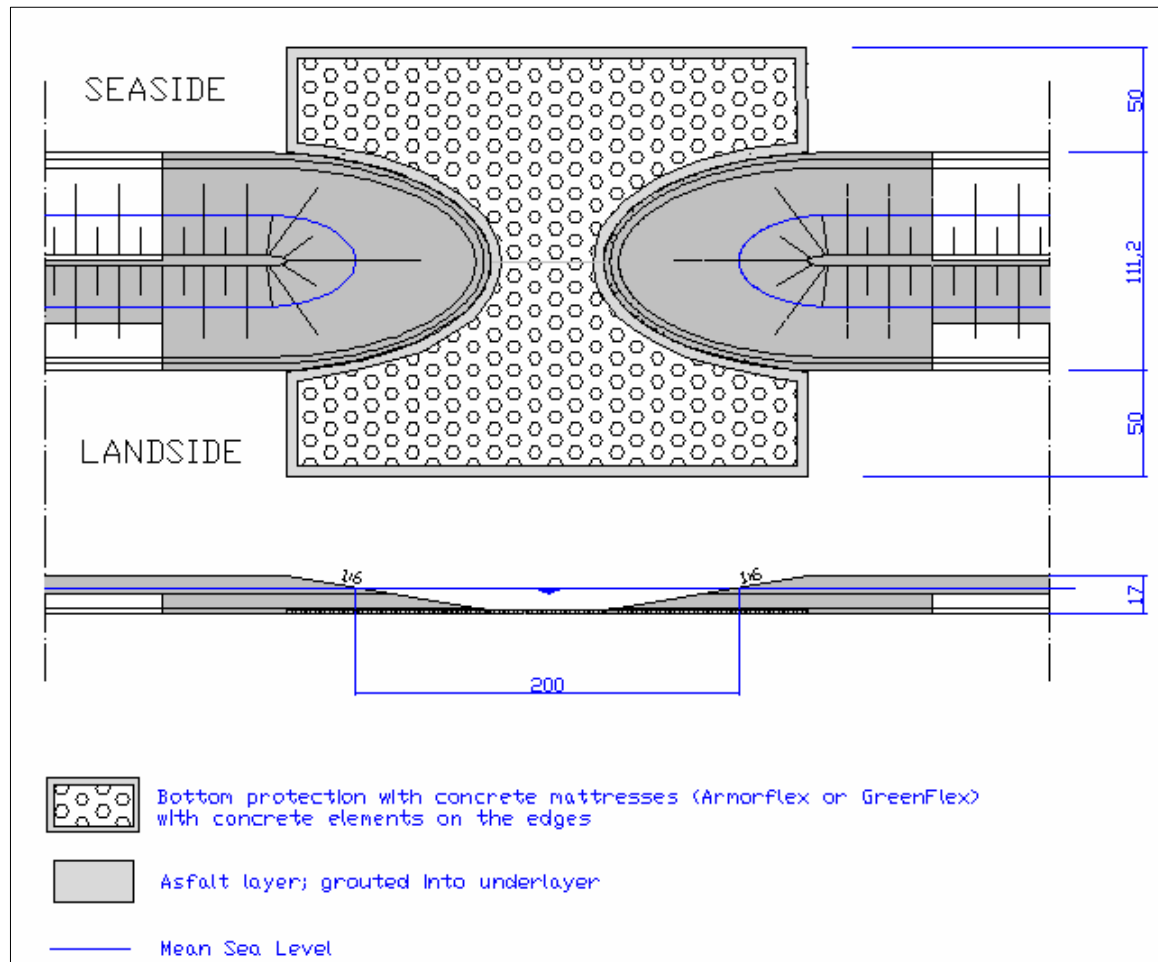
Plan view and cross section of gap and general layout of gap protection
